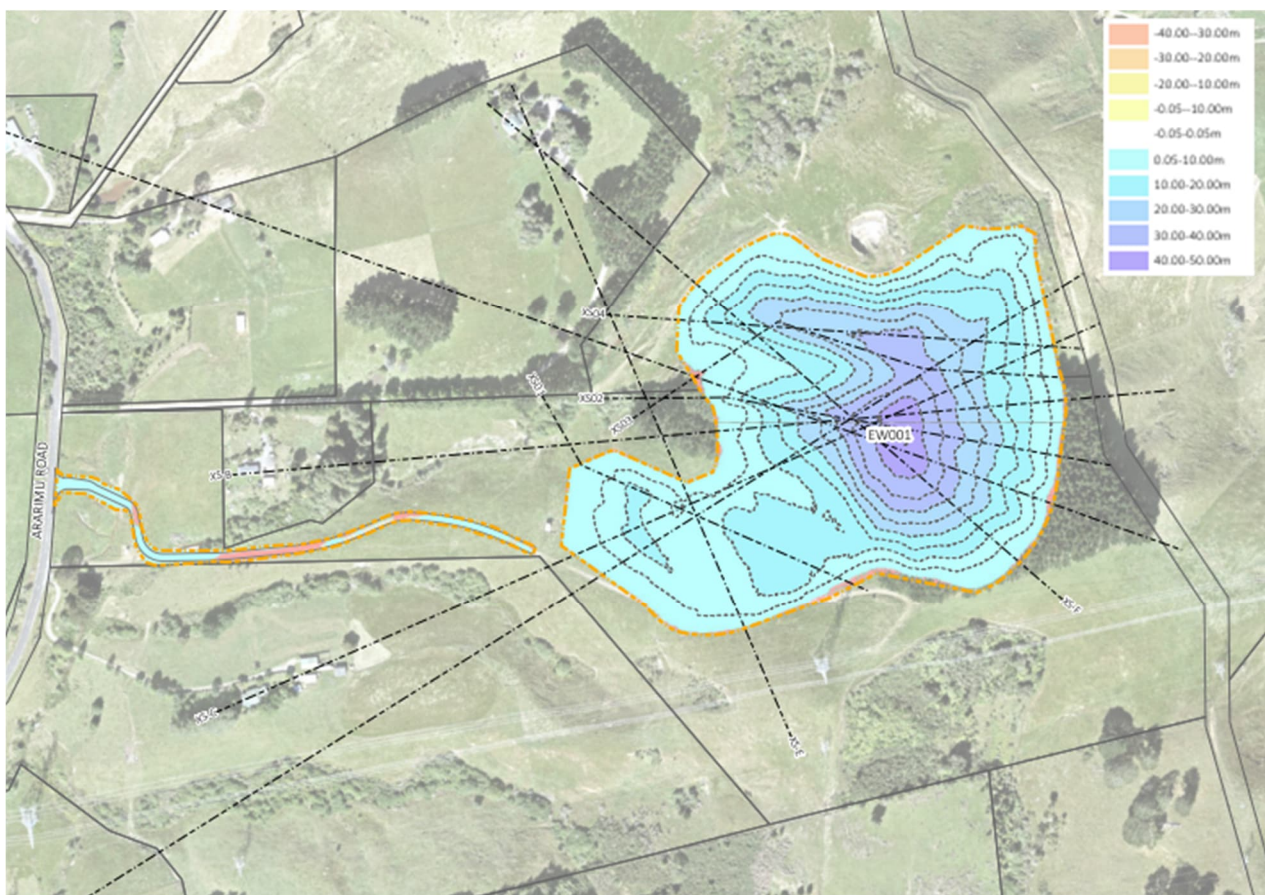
Proposed fill development. (From CivX Cut and Fill Drawings Package).
